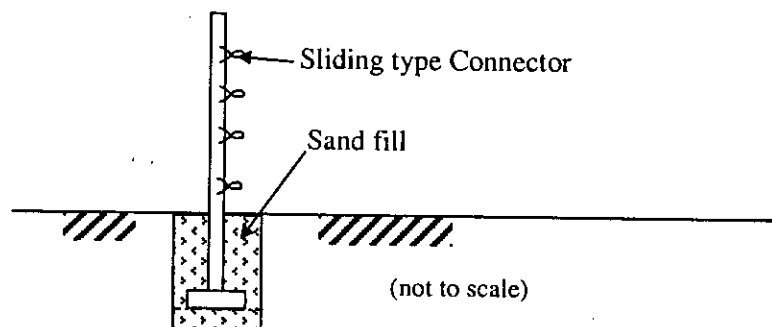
Step 2; Erection of concrete facing wall with small pad
